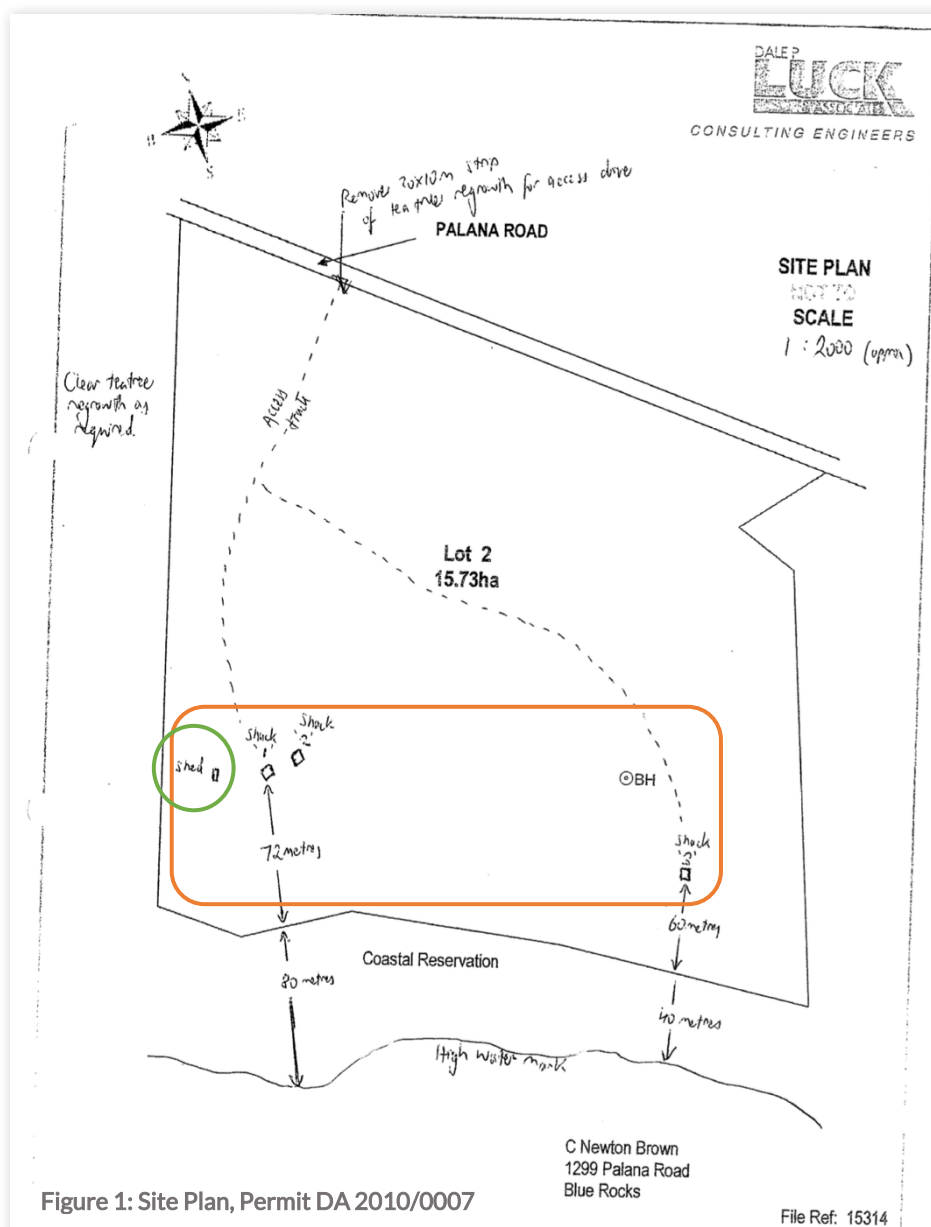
excerpt of the 2025 Minor Amendment Assessment showing the site plan originally approved by DA 2010 / 0007 on 22 April 2010. The orange area shows the location of the various approved buildings. The green area shows the location of the original approved shed.
